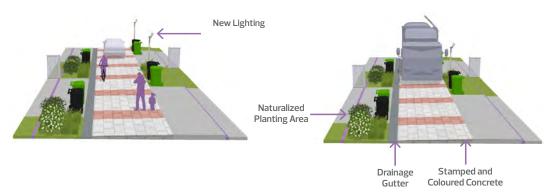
Shared street: connection between AltaLink Utility Corridor and 167 Avenue - Cross sections
